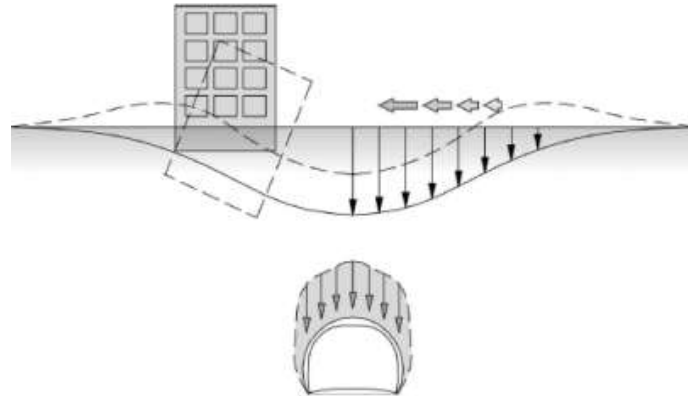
Behaviour of nearby Ground due to tunnel excavation (Han & Hwang, 2017)
